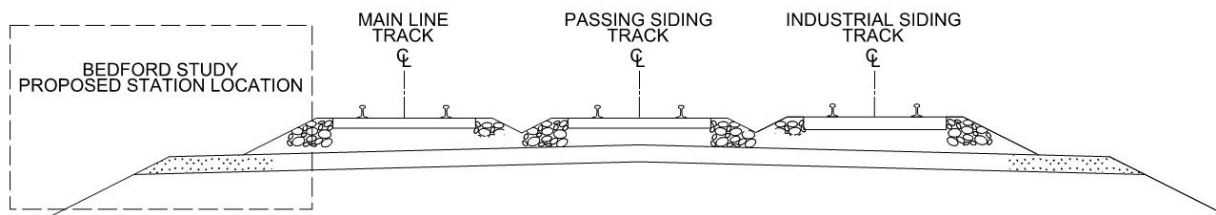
Norfolk Southern Railroad section through preferred station site location (looking west)
